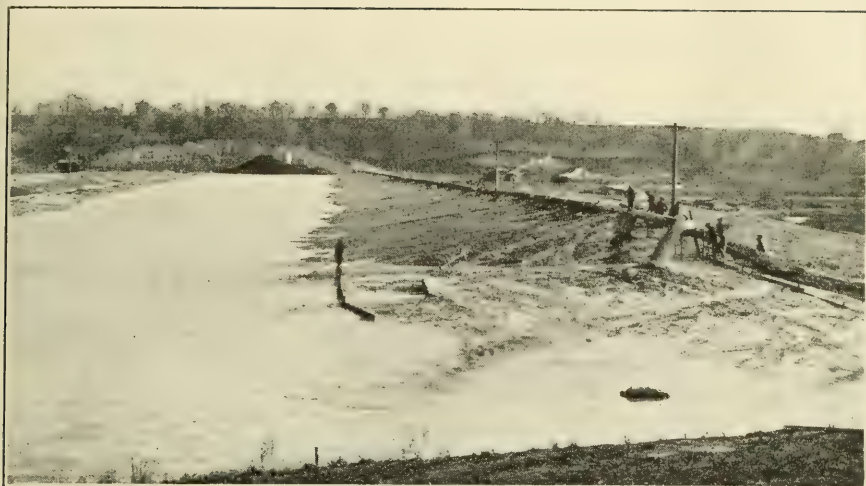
METHOD OF PLACING HYDRAULIC FILL
